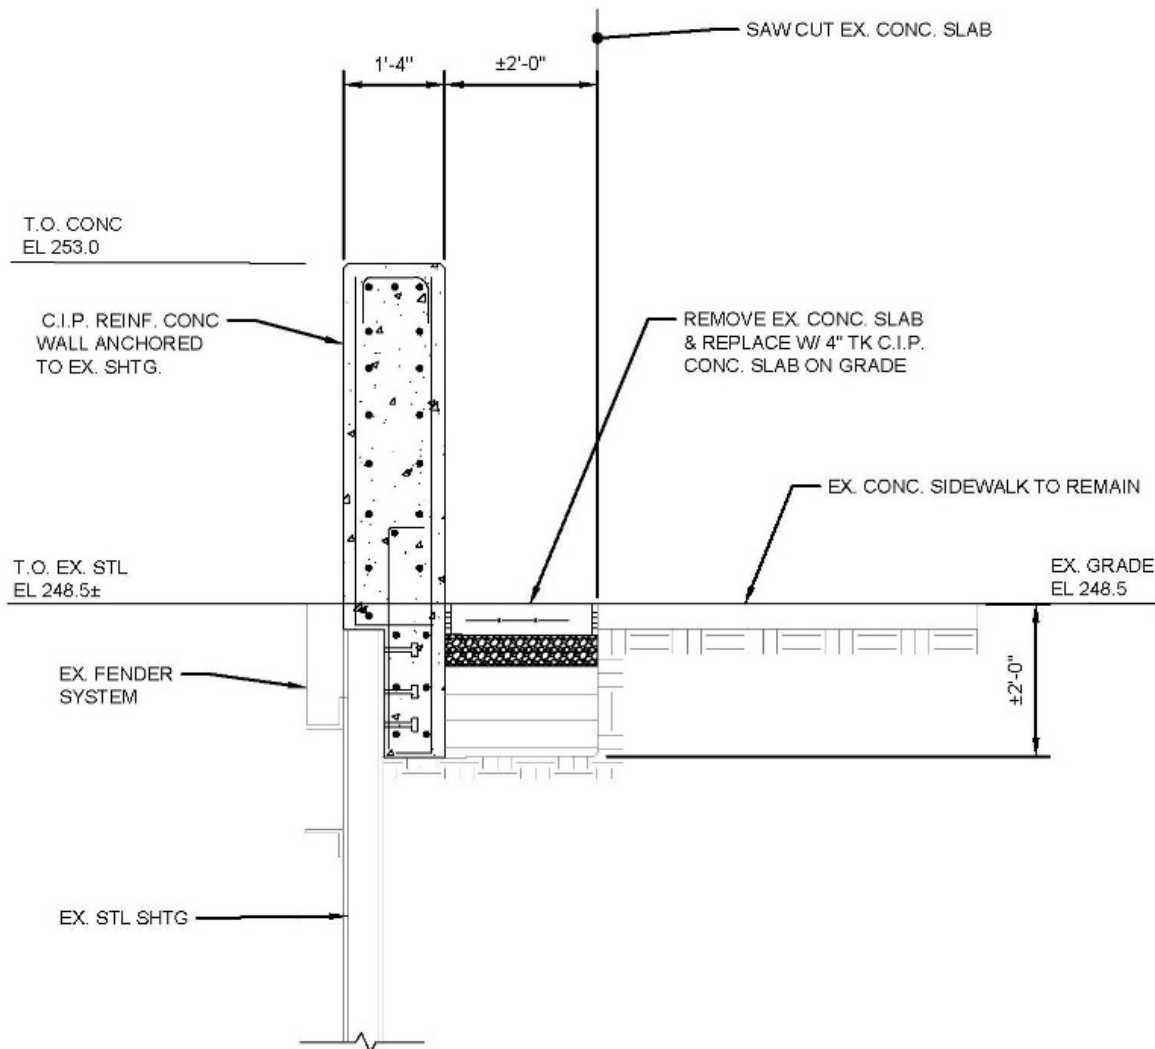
NYSDEC Fishing Access Existing Shorewall Modifications Typical Detail
